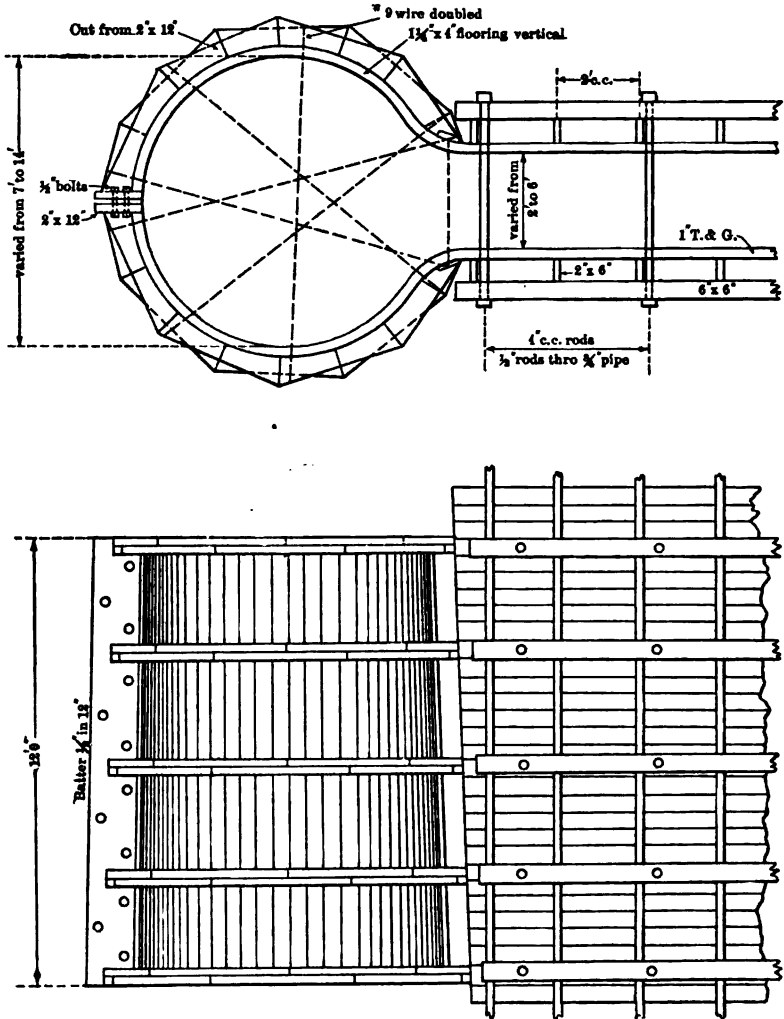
PIER SHAFT FORMS, CITY WATERWAY BRIDGE, TACOMA, WN.
